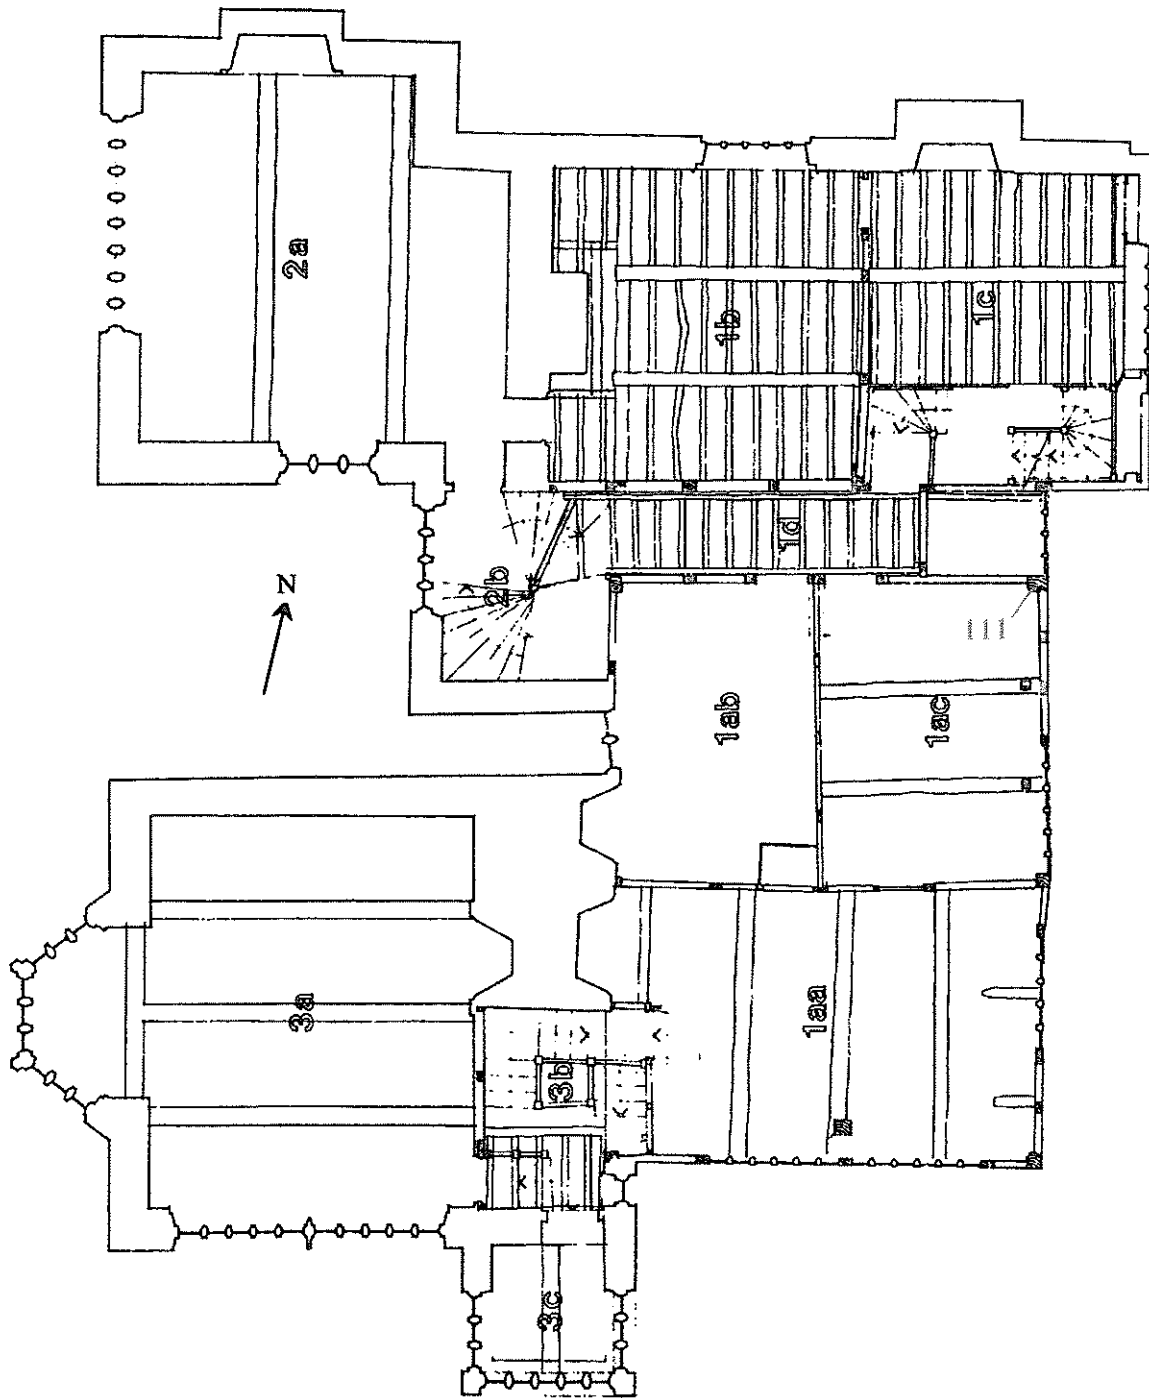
The ground floor plan of Hall I' Th' Wood showing the approximate location of core samples 101-110 inclusive.
